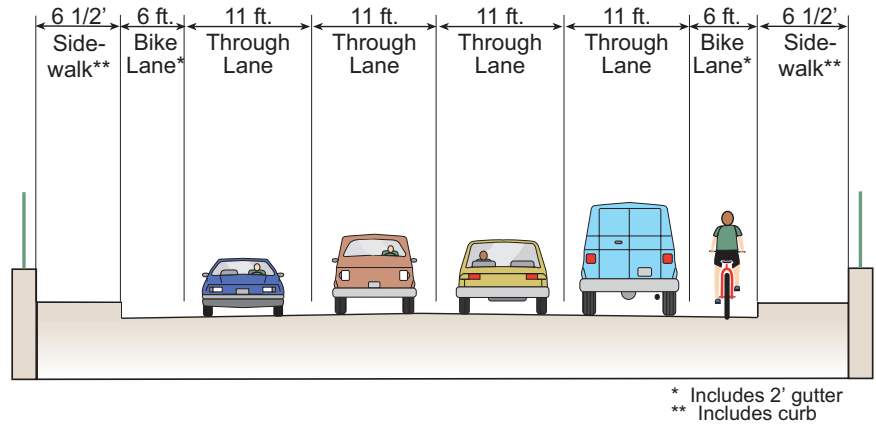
Typical cross sections of bikeways on streets and reconstructed bridges.
